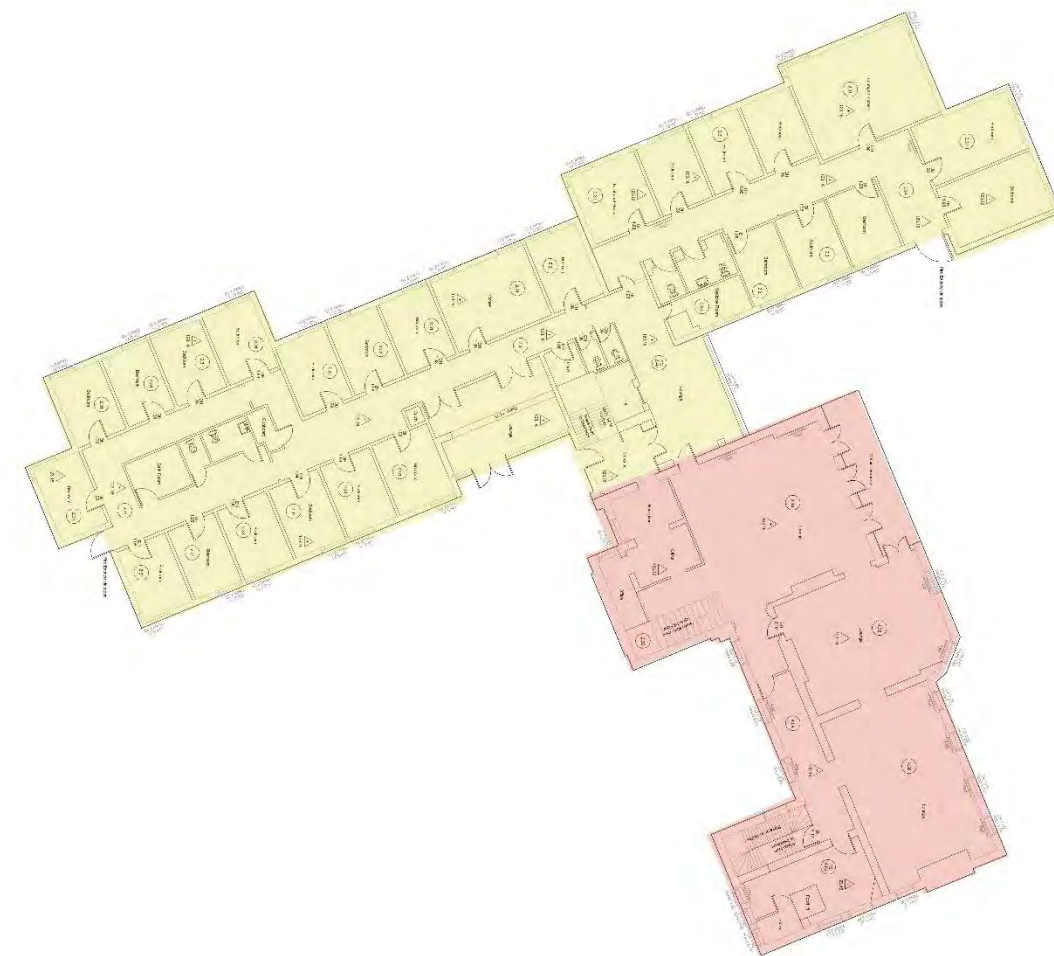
Ground floor plan of Branch Hill House showing the Edwardian building (red) and the modern extension (yellow)
